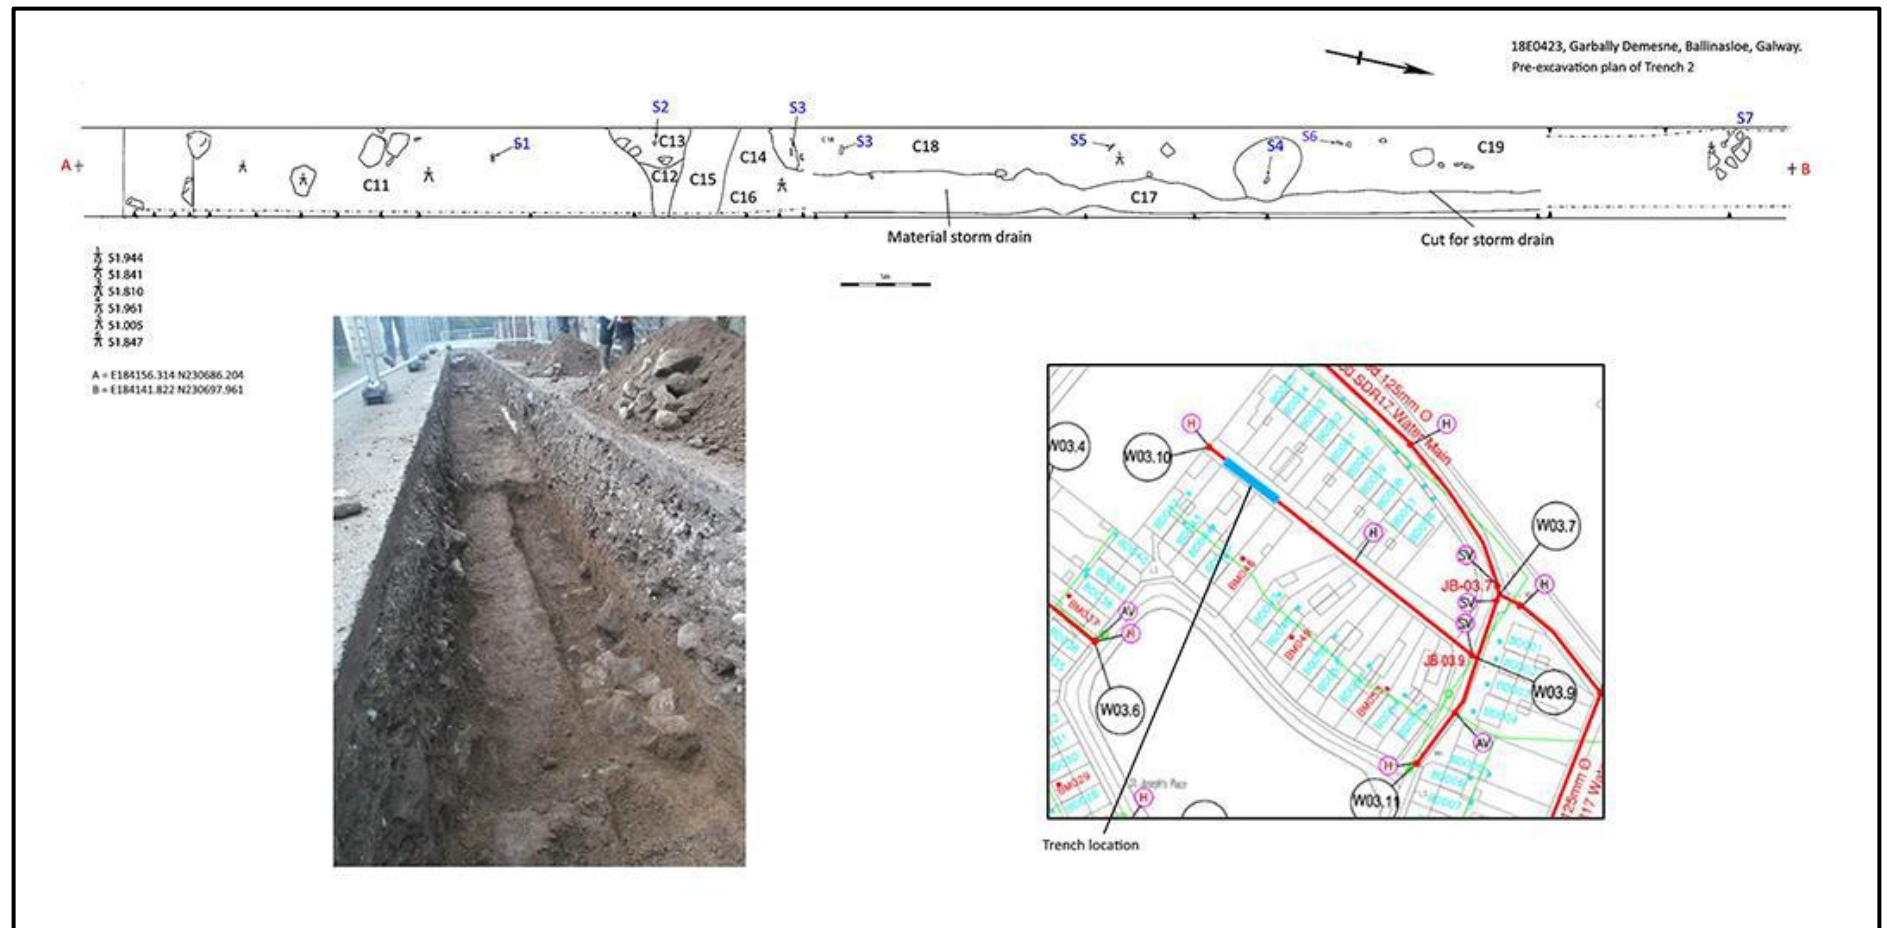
Pre-excavation Plan of main section of Archaeological Trench showing C11, C12, C13, C14, C15, C16 C17, C18, C19
